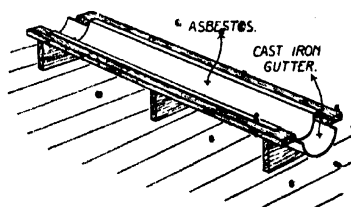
METHOD OF Moulding the MILL-BOARD.
